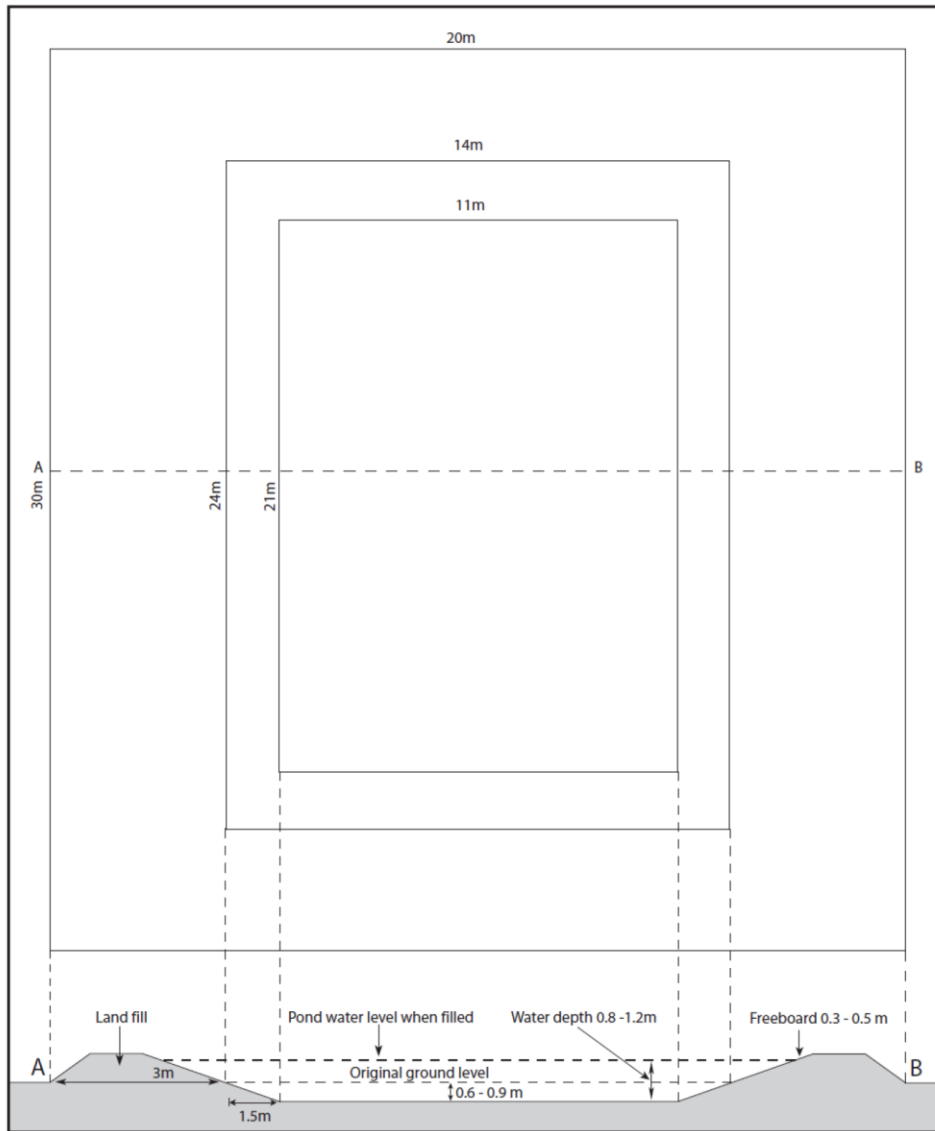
Ground plan for a hand-dug pond (top) and cross-section of pond along A-B (bottom)
